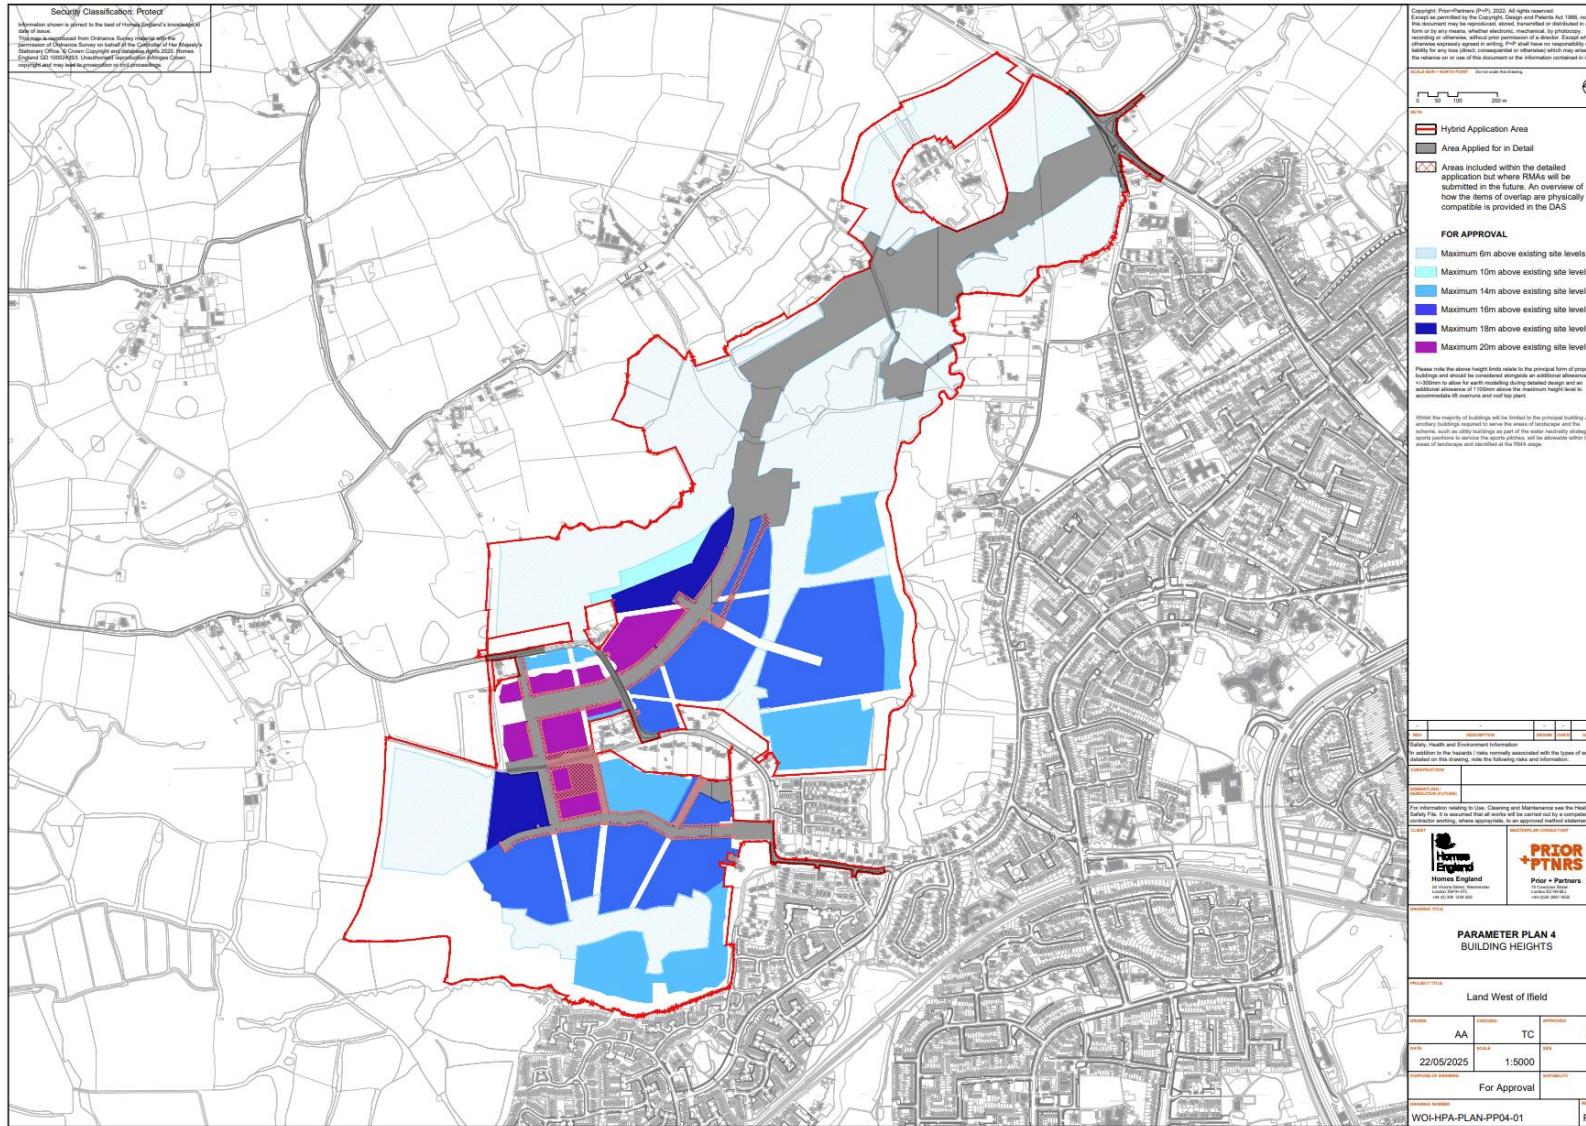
Proposed Building Heights Parameter (Parameter Plan 4: Building Heights, WOI-HPA-PLAN-PP04-01)
